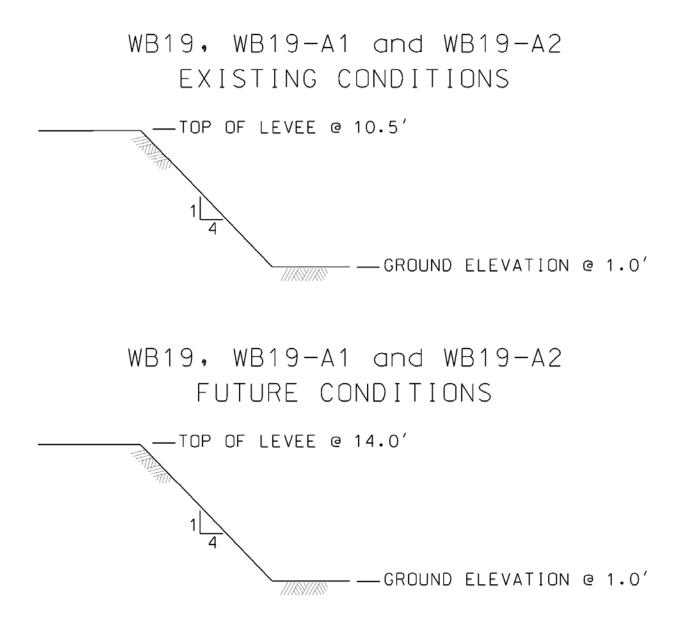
Typical Levee Design Cross-sections Transition Point Hero Canal to Oakville (WB19), Hero Canal Area West and East of Pump Station (WB19-A1 and WB19-A2) The typical levee design cross-sections for the 1% design existing and future conditions of Algiers Canal East and West Bank (WB30-L1) and Algiers Canal East Bank Levee (WB30-L2) is shown in Figure 4-9. The 1% hydraulic design elevation for both levees for existing conditions must be 8.5 ft and 8.5 for future conditions. The construction design grade elevation for (WB30-L1) is 9.2 ft, which are the hydraulic design elevation plus 0.7 ft of over-build. The design grade elevation for (WB30-L2) is 9.1 ft, which are the hydraulic design elevation plus 0.6 ft of over-build.
